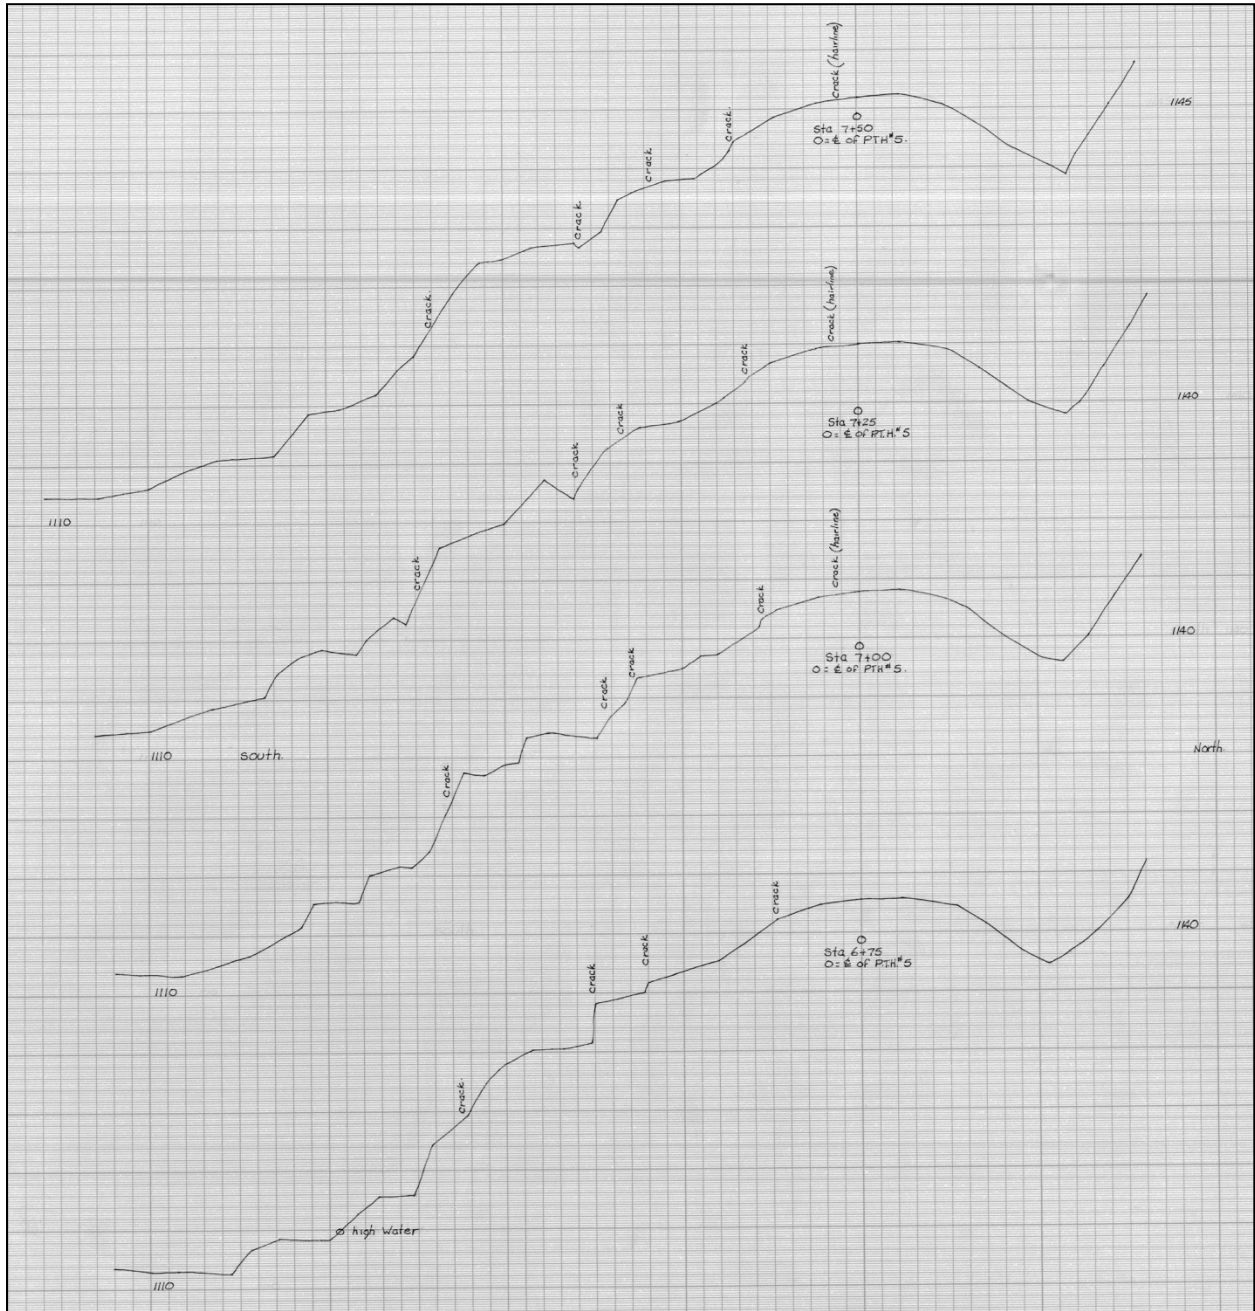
1974 Ashville Junction Cross Sections (Note – station 0+00 at centerline of intersection between PTH 5 and PTH 10)
